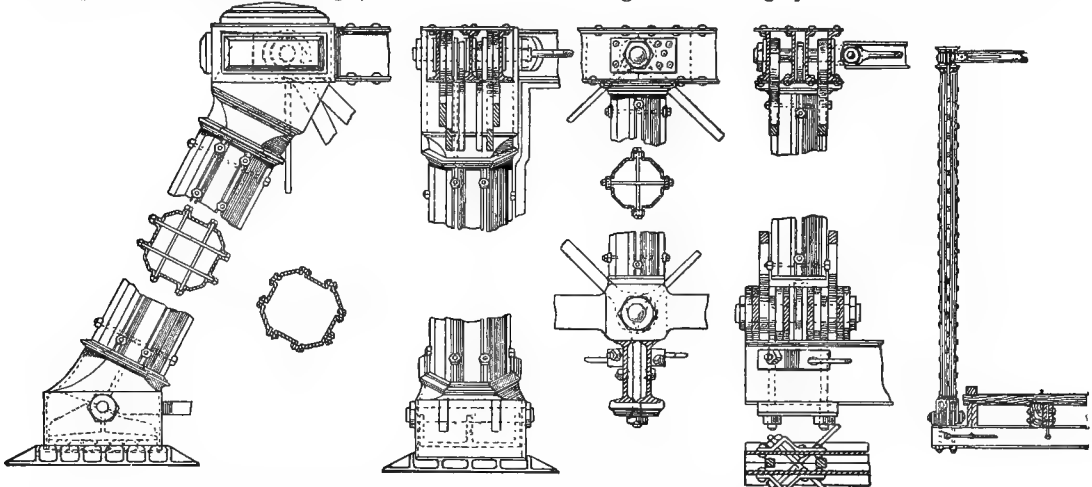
Connections for Through Bridges, Keystone Bridge Co., Pittsburg.
